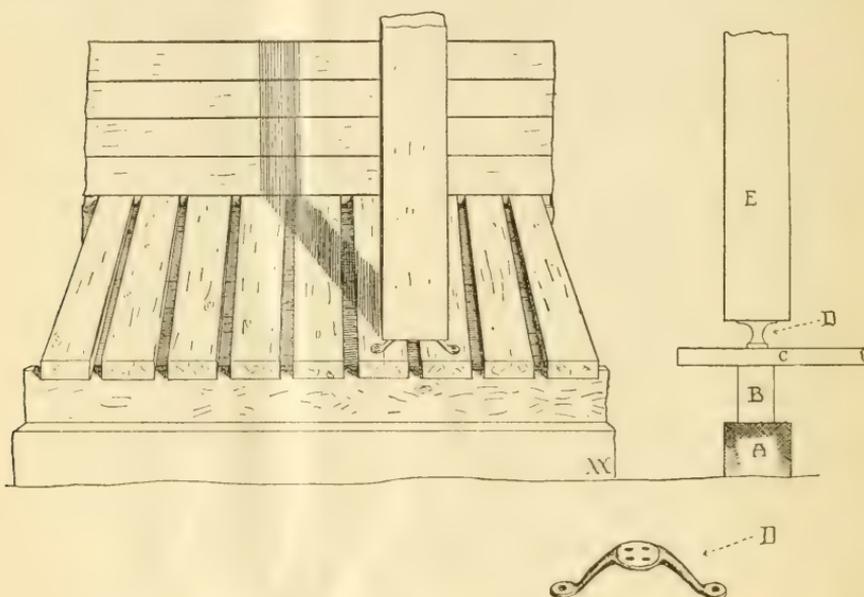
Properly laid platform planking and foundations for pillars, Falls Church, Va.: A, concrete base; B, stringer; C, planking; D, iron rest; E, pillar. (Original.)
